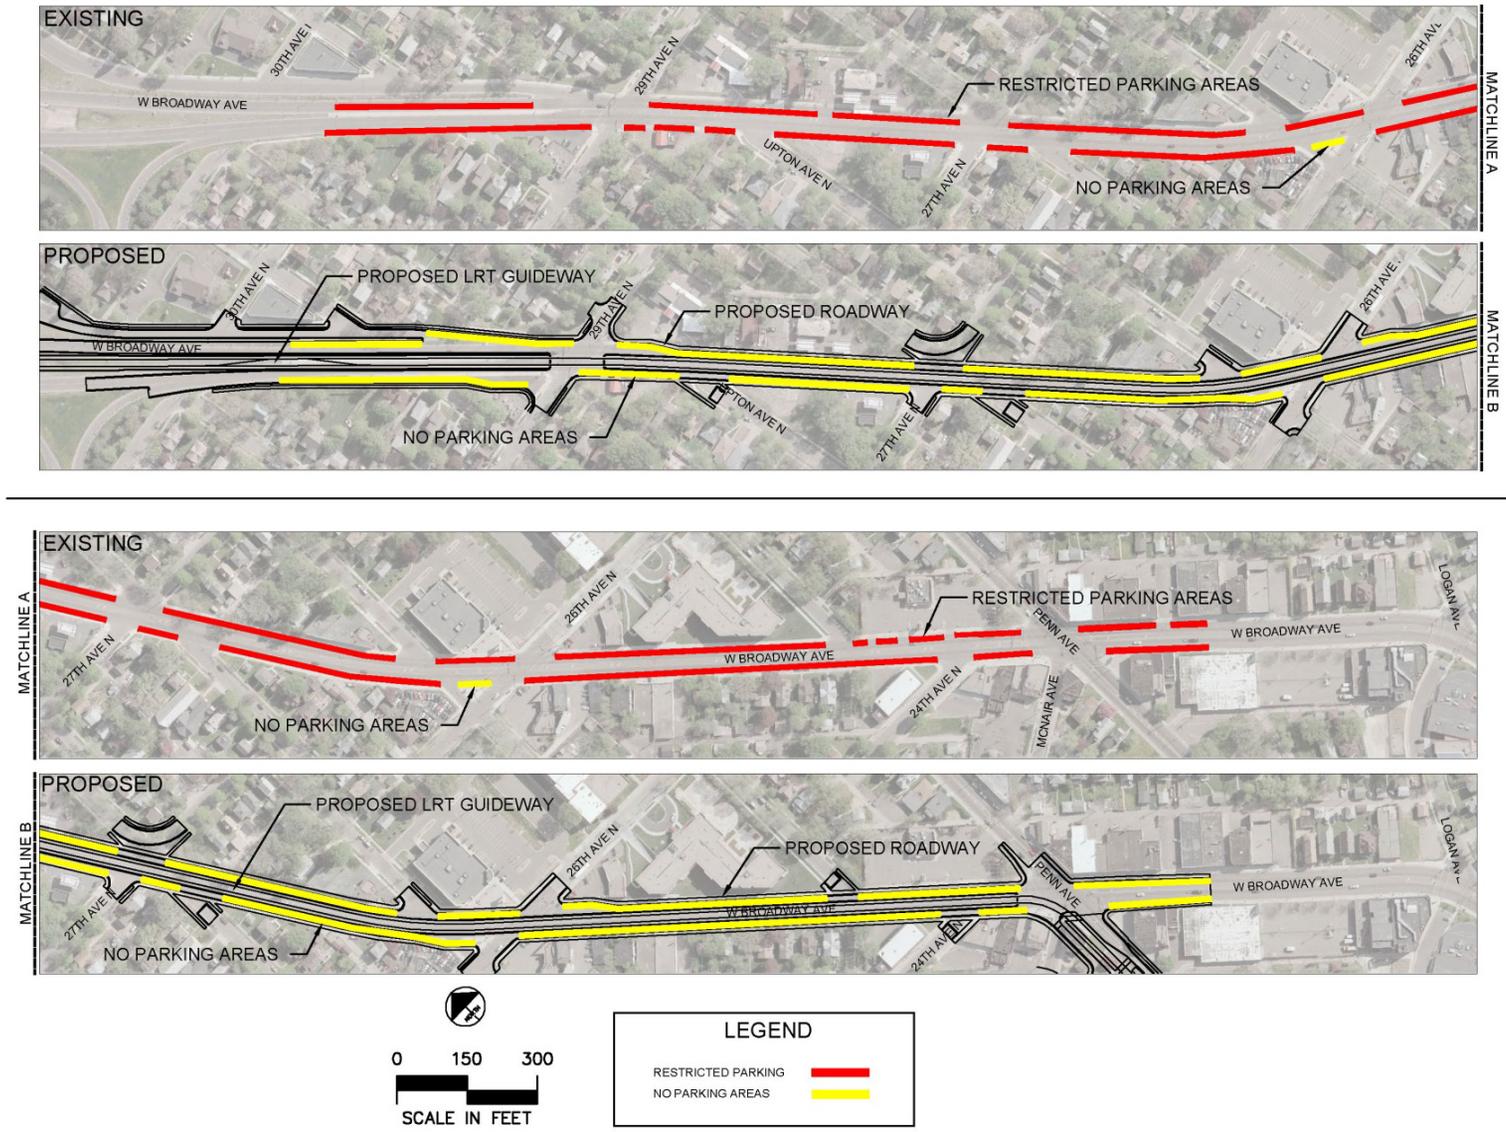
Alignment D2: Penn Avenue Parking Impacts (1)
